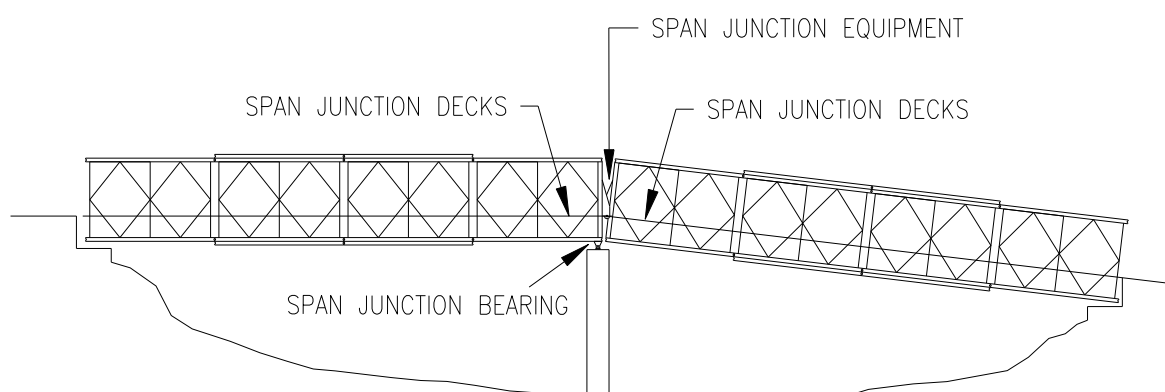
ARTICULATED SPAN JUNCTION - STATIC
